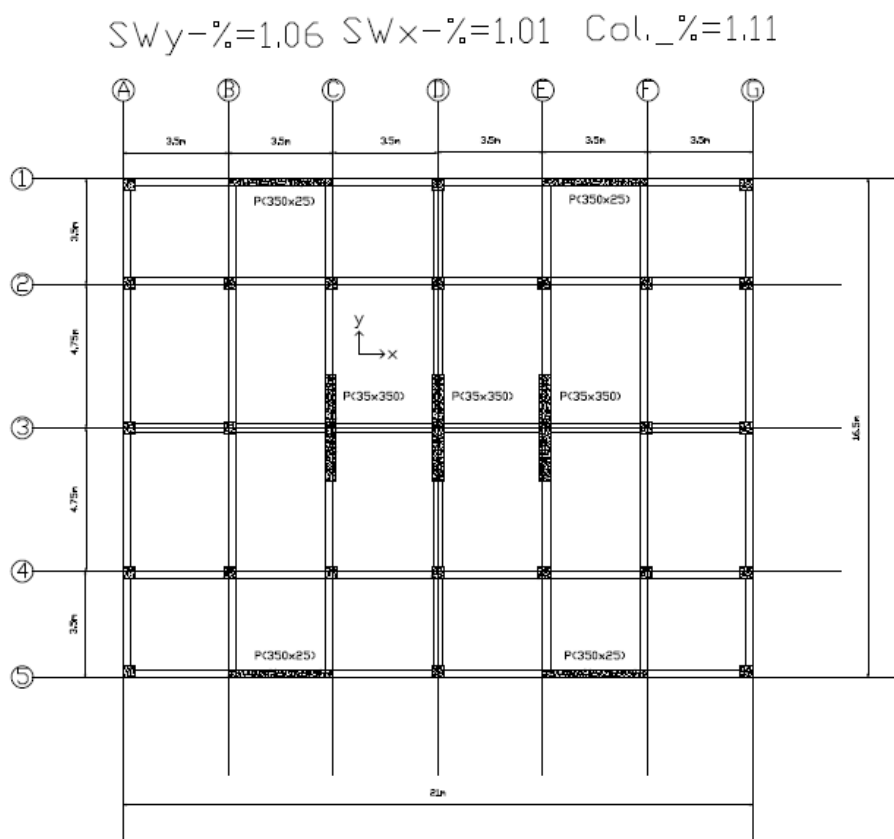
Plan of Model 23 with Different Wall Configuration and 1.0% Wall Area to Floor Area Ratio in Each Direction
